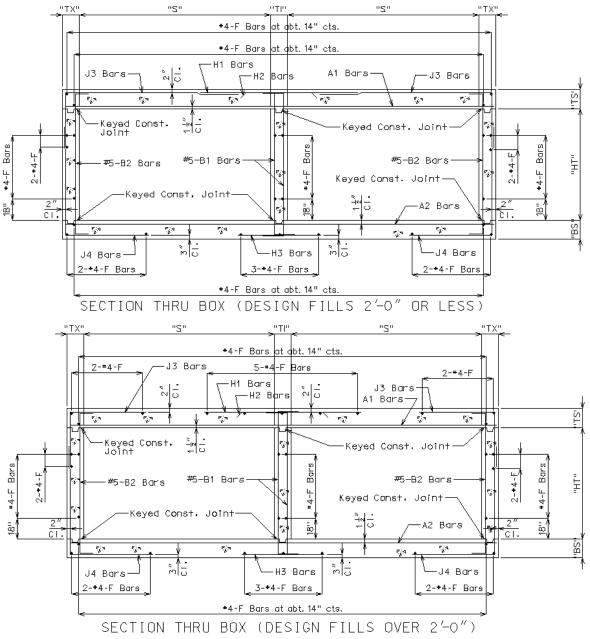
Typical cross section of standard box culvert showing bar marks
